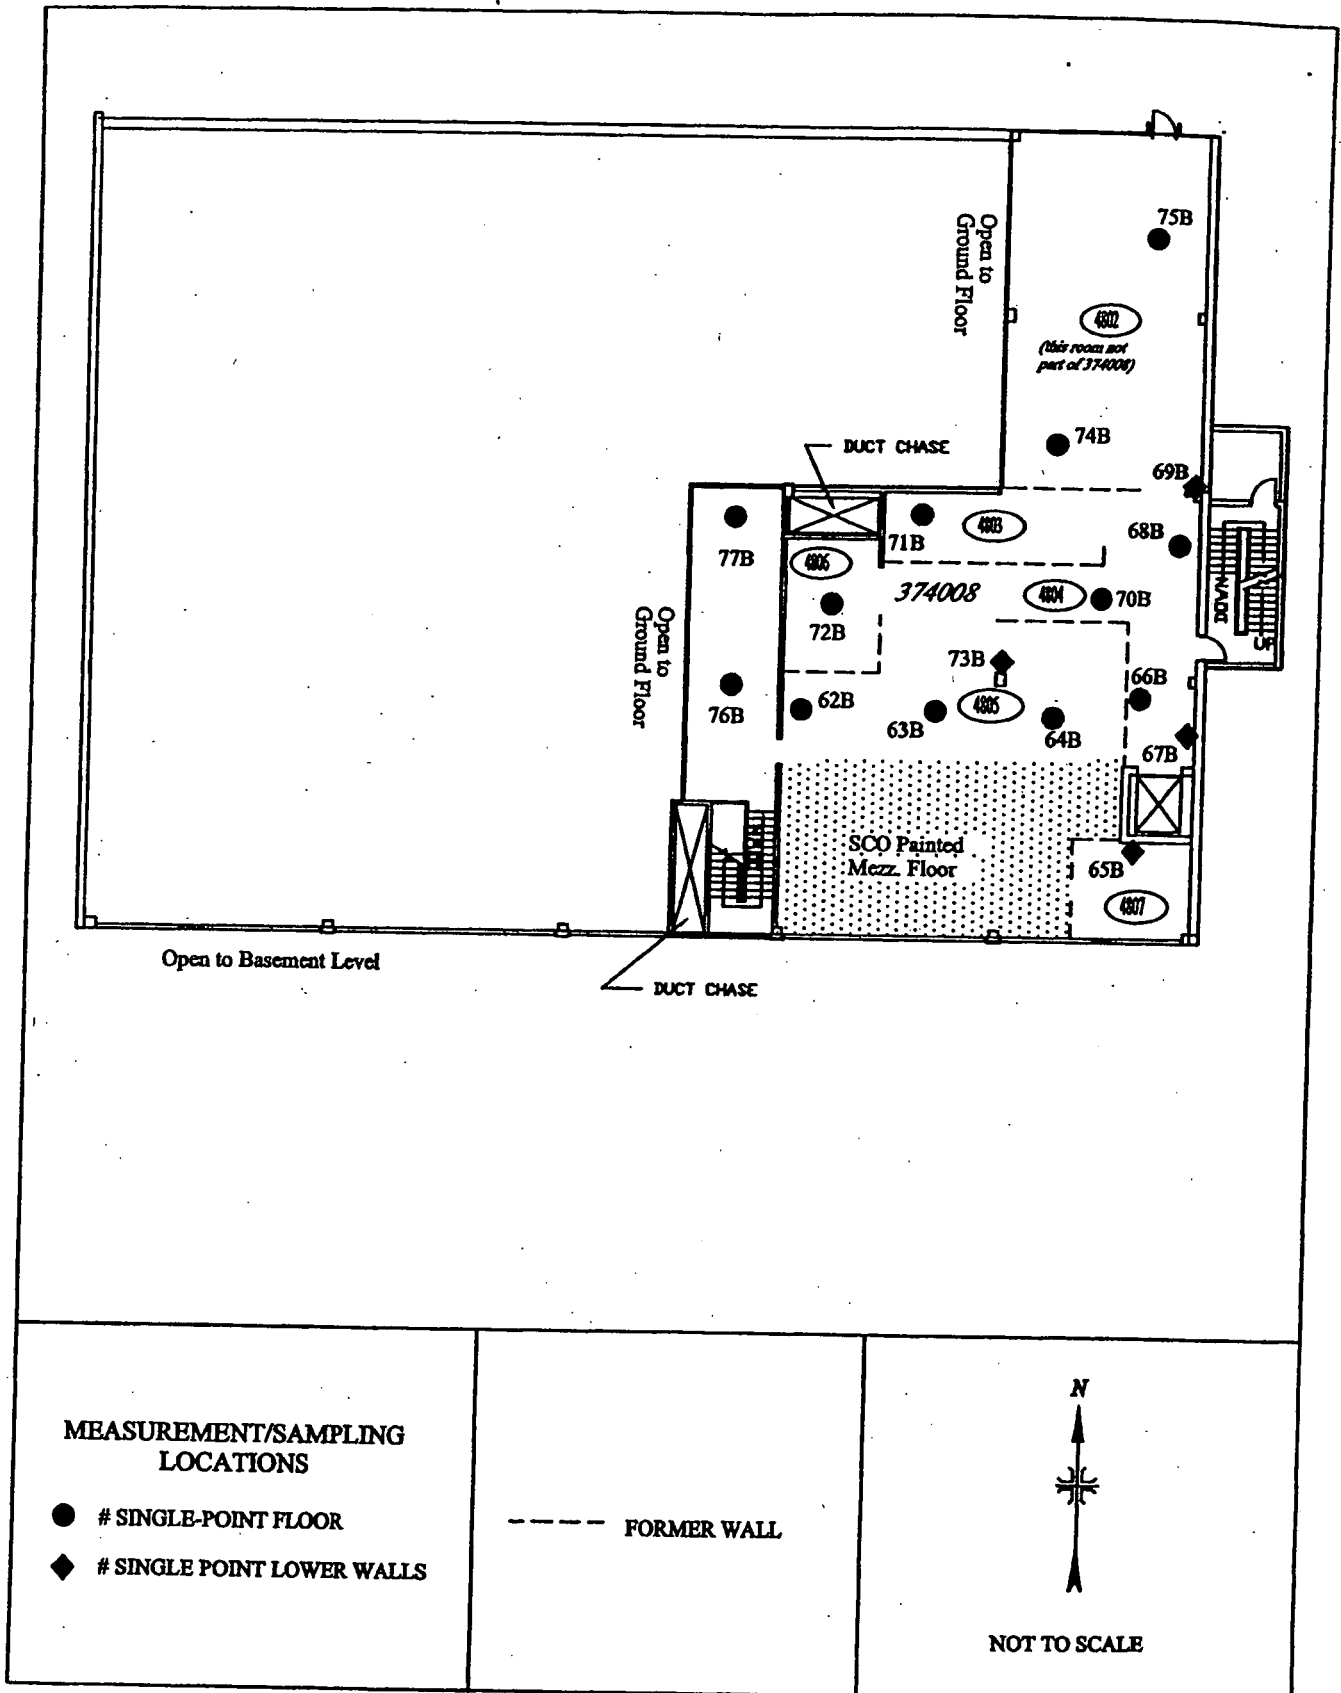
Mezzanine - Lower Walls and Floor - Measurement and Sampling Locations
